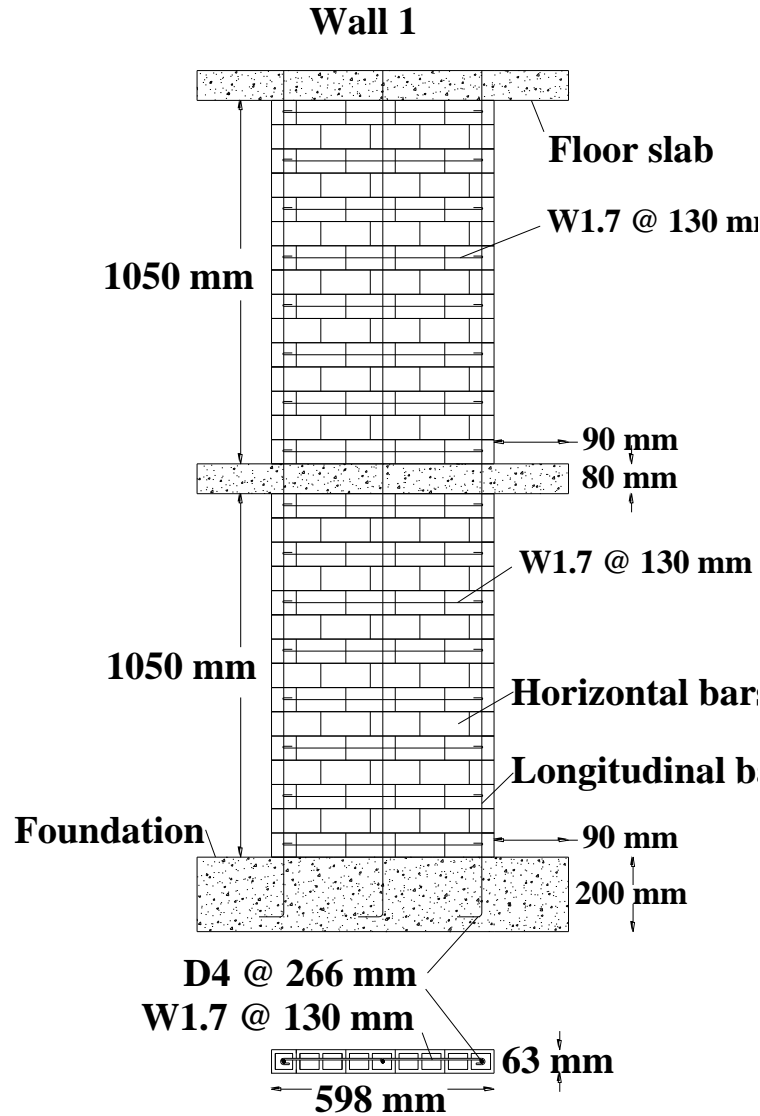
Elevation and cross section of the experimental third-scale model of Wall 1
